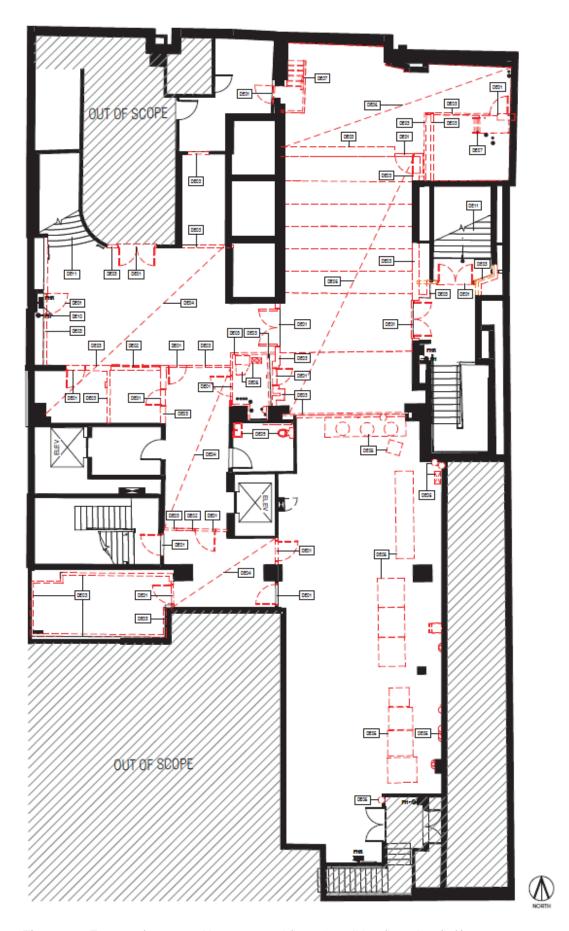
Extract of proposed lower ground floor demolition floorplan (left)
